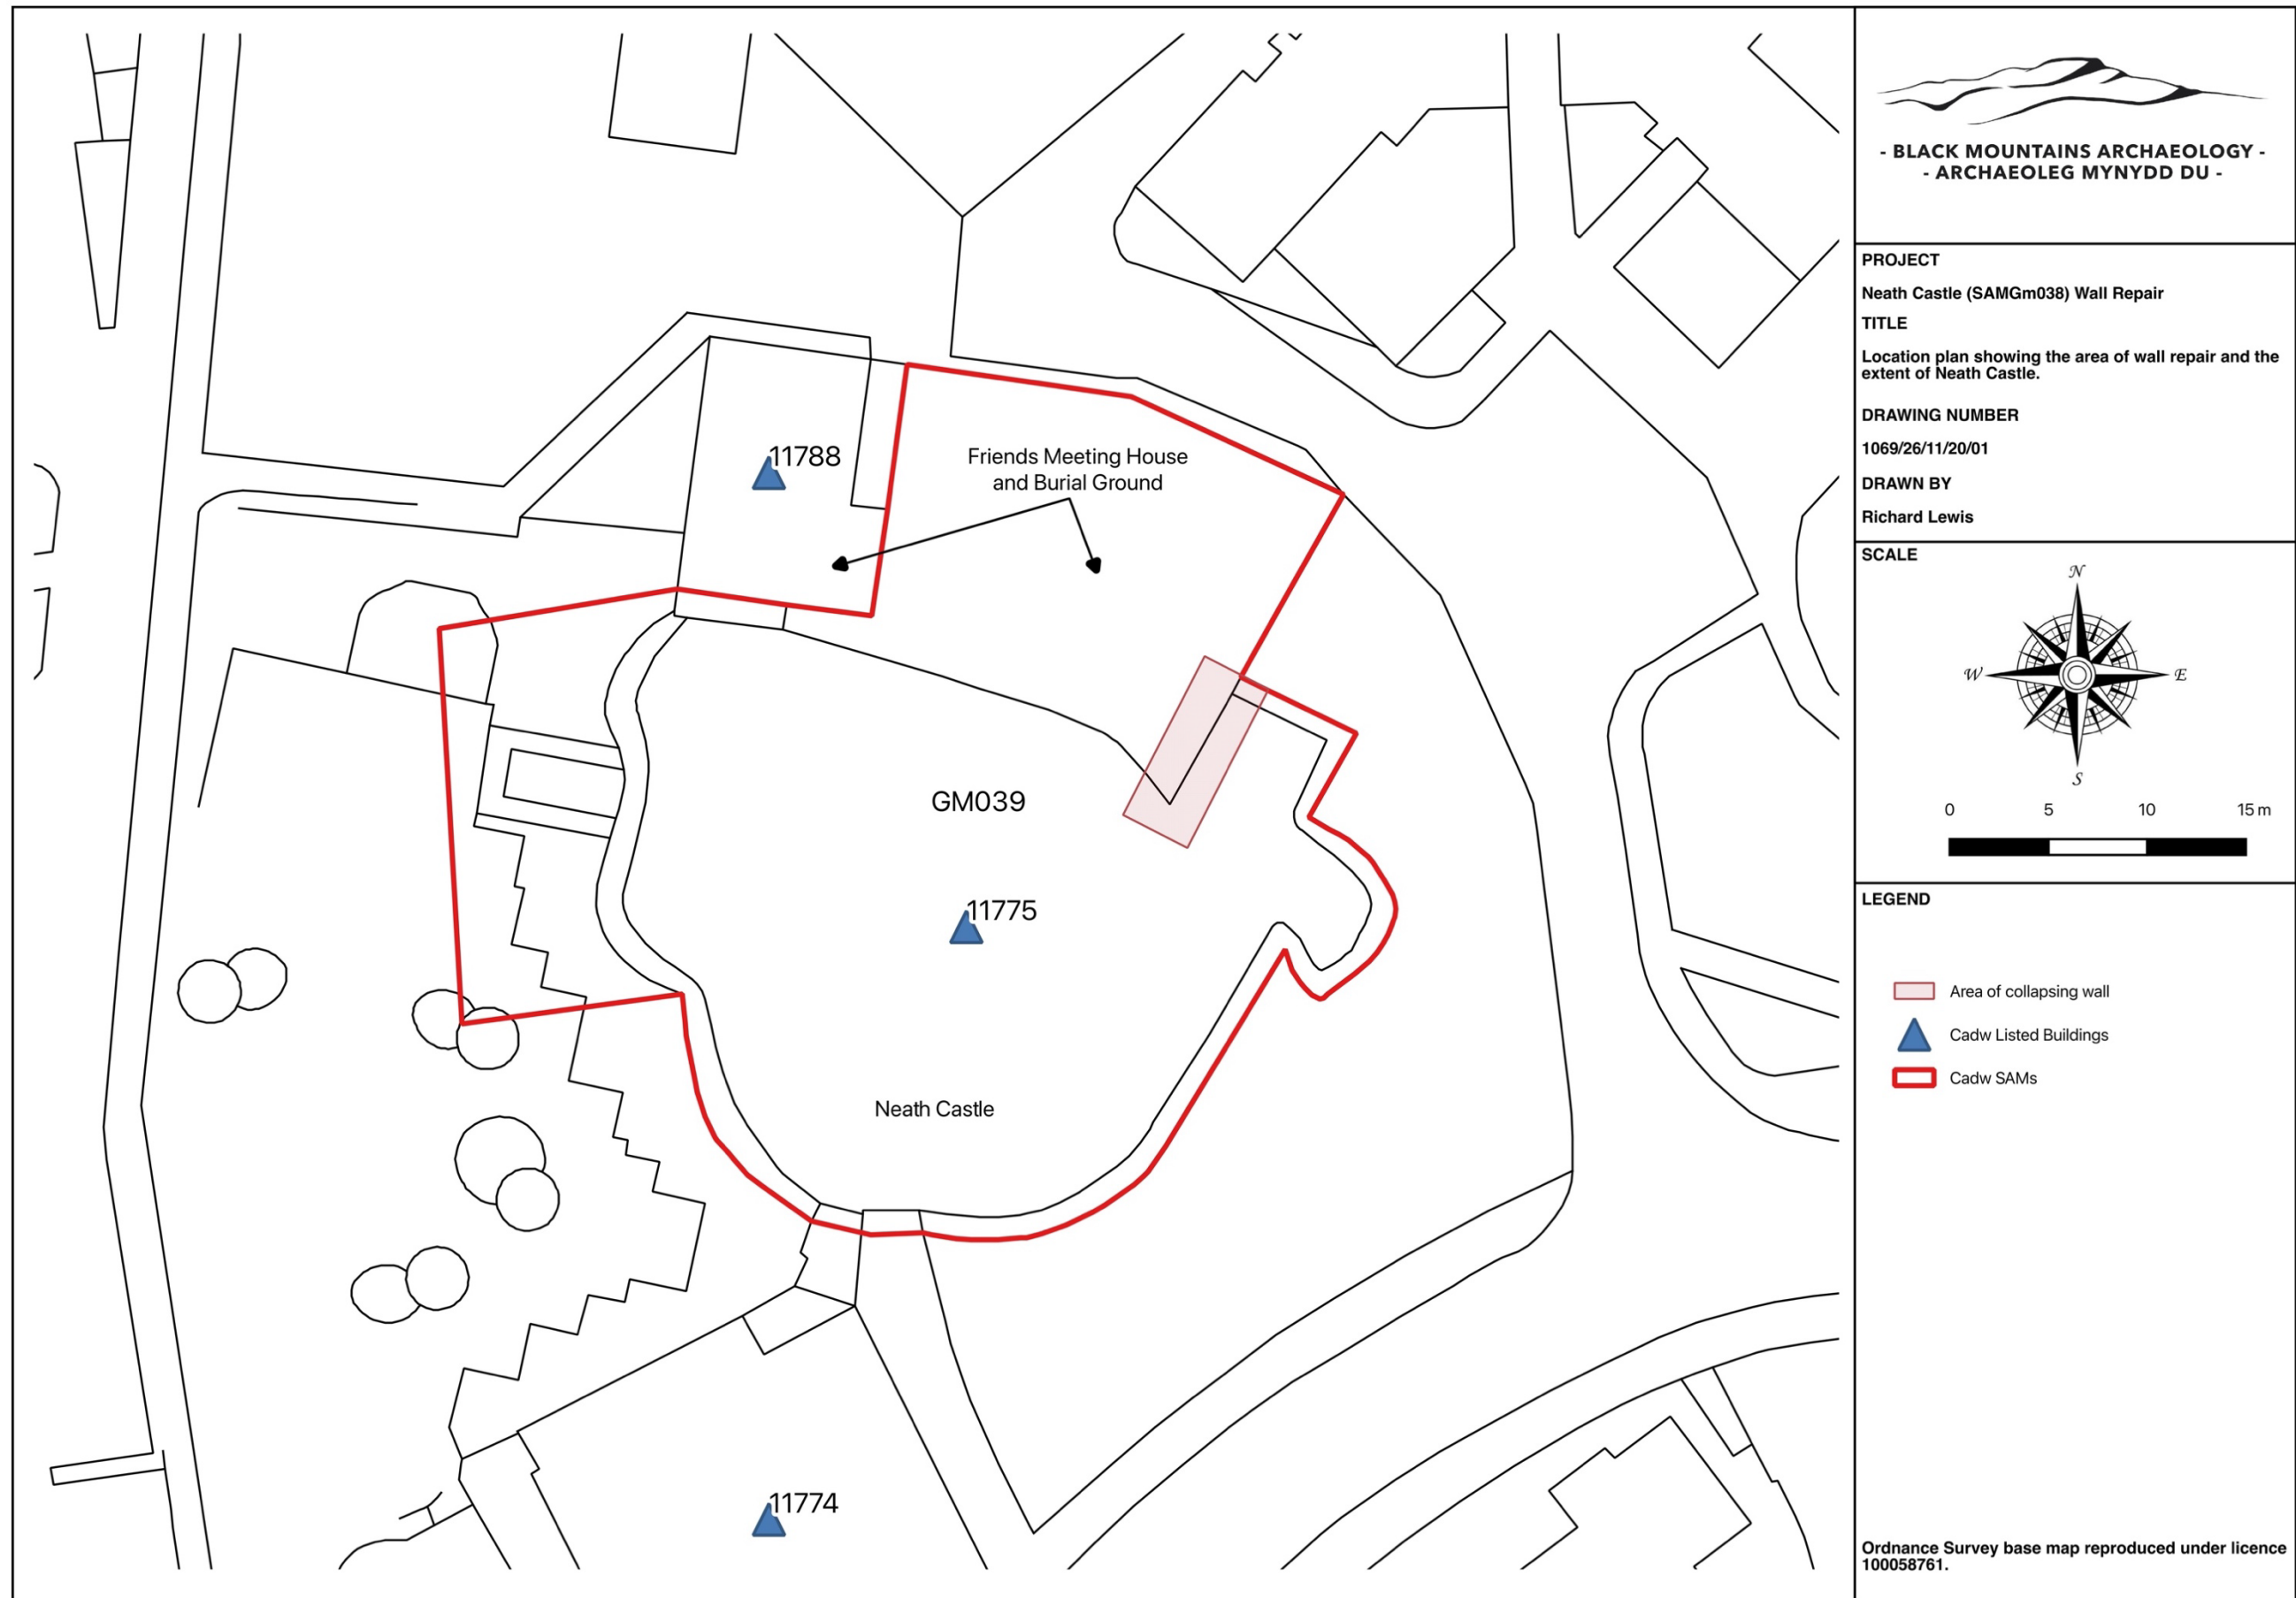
Location plan showing area of wall repair and the extent of Neath Castle (SAMGm039).
